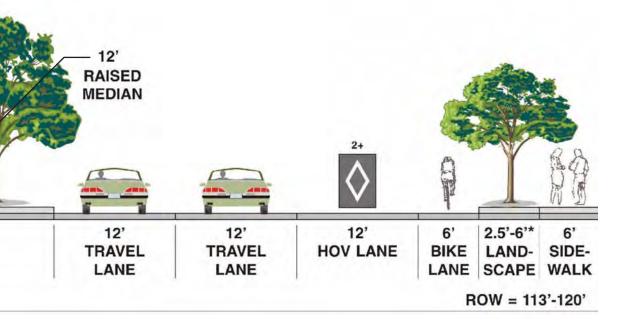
BOISE STATE STREET TOD PLAN REVISED STATE STREET SECTION State Street widened to seven lanes with curbside HOV lanes (23rd Street to Glenwood Street)
